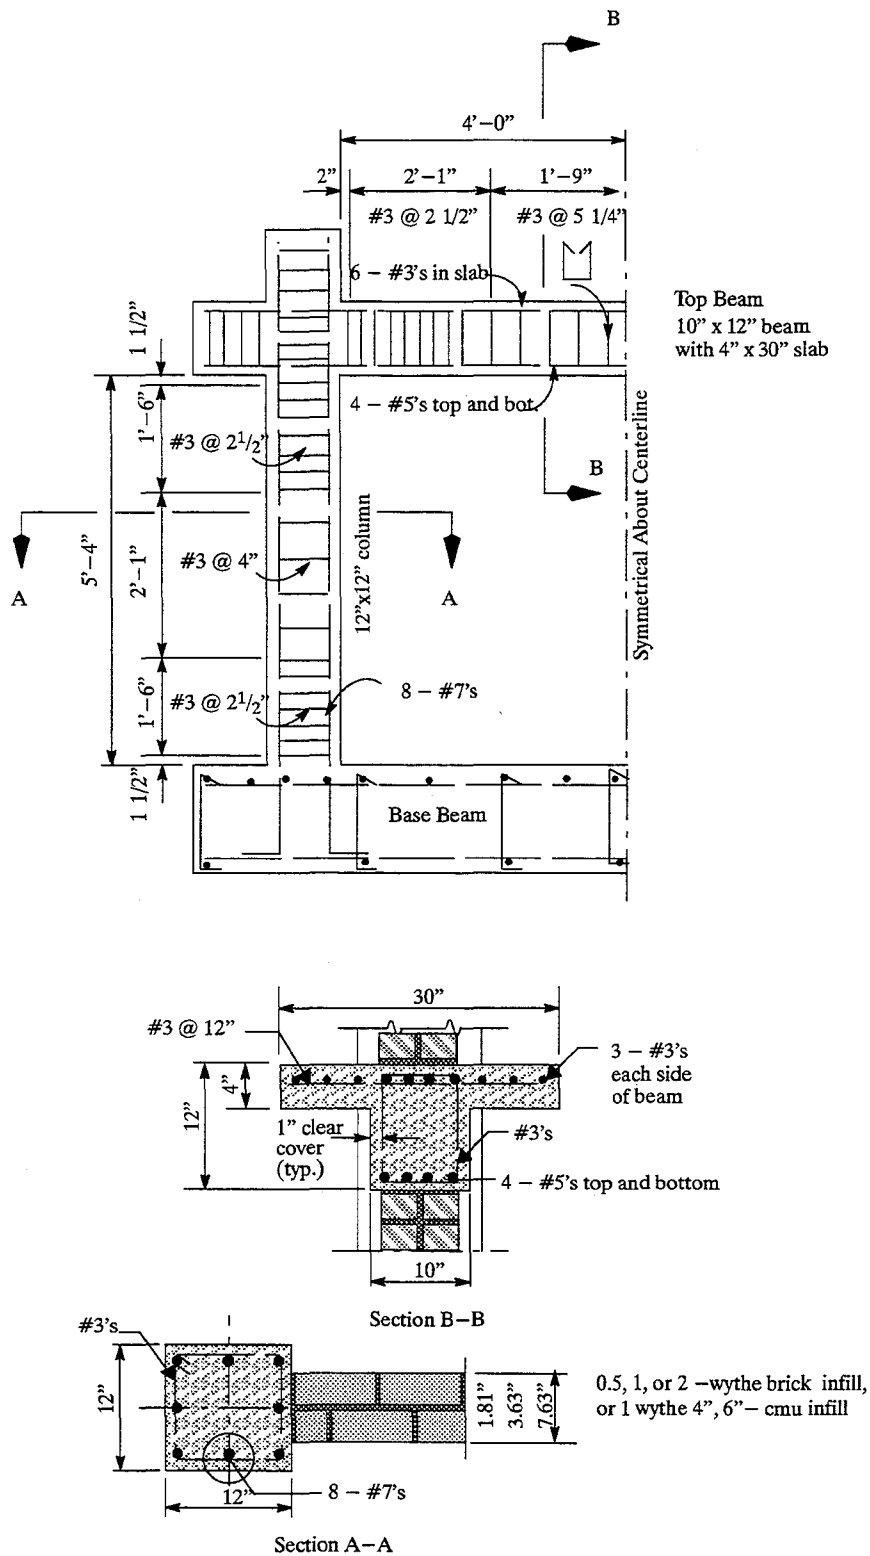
Reinforcing Design for Reinforced Concrete Frame
